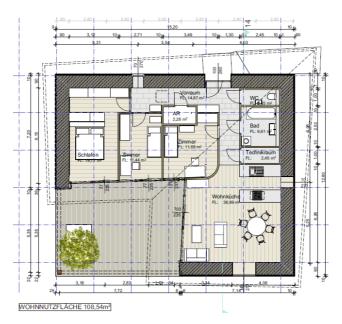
Optimised temporary floor plan (Arch. Scheicher)
